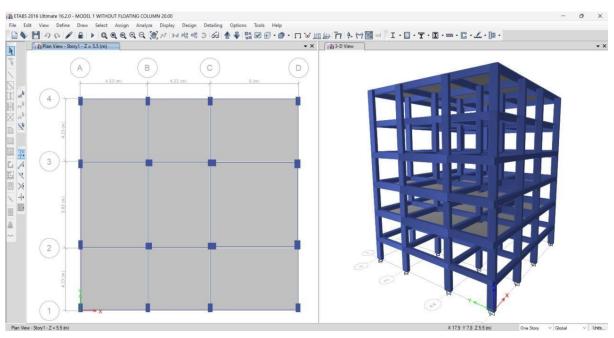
Model 1 – Plan & 3D view of Building without floating column
